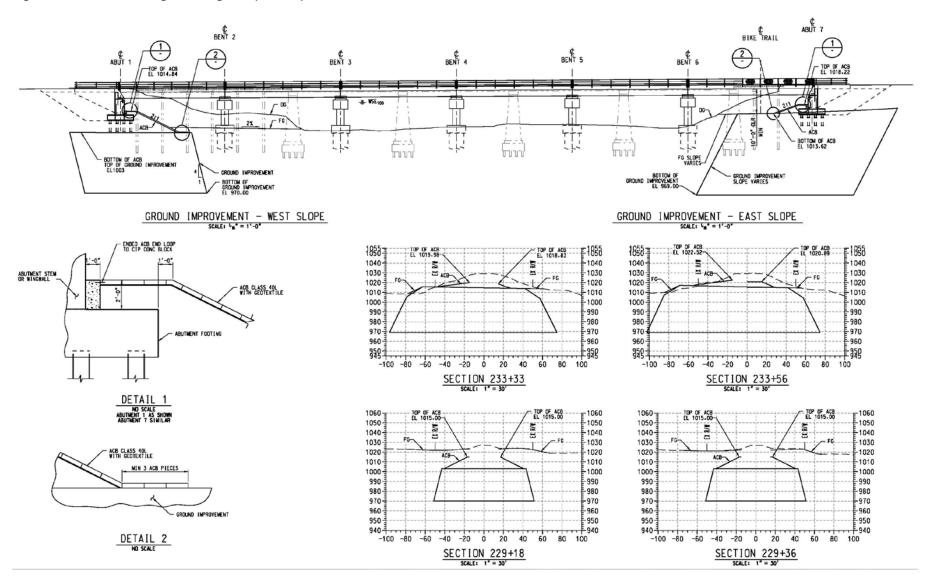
Foundation Design at Bridge 3.4 (Vertical)
